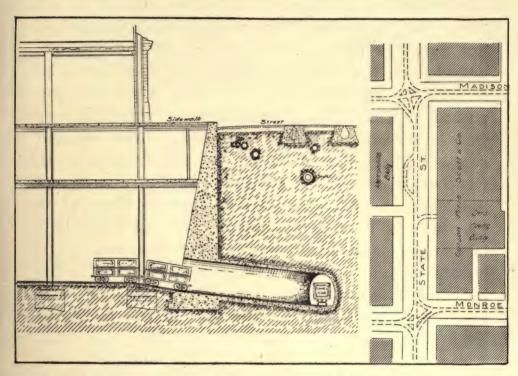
PLAN AND SECTION SHOWING A TYPICAL CONNECTION OF THE ILLINOIS TUNNEL COMPANY TO A WAREHOUSE BUILDING
